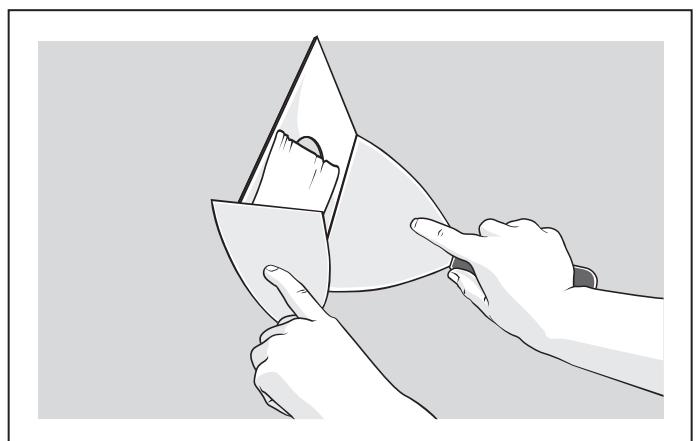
APPLY HARDISTOP BASE COAT OVER EPOXY FILLED SCREW HEAD
